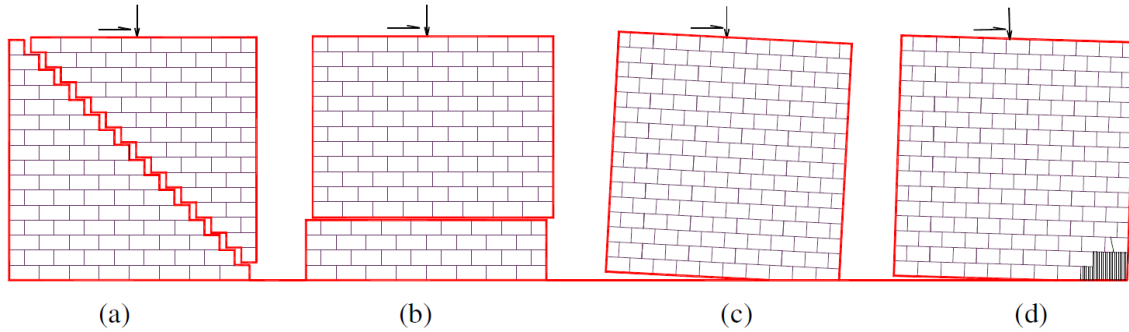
In-plane failure modes of a laterally loaded URM wall: a) Shear failure, b) Sliding failure, c) Rocking failure, and d) Toe crushing.
